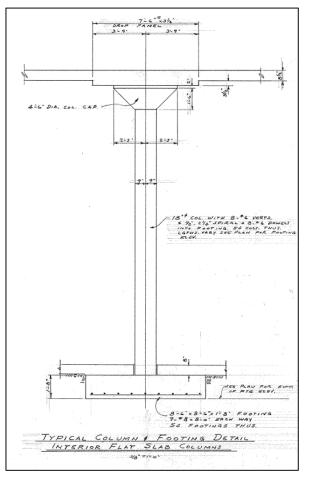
details the typical column and footing of the existing reservoir. This detail was taken from the reservoir as-built drawings prepared in October 1958 by Banister Engineering Co.
